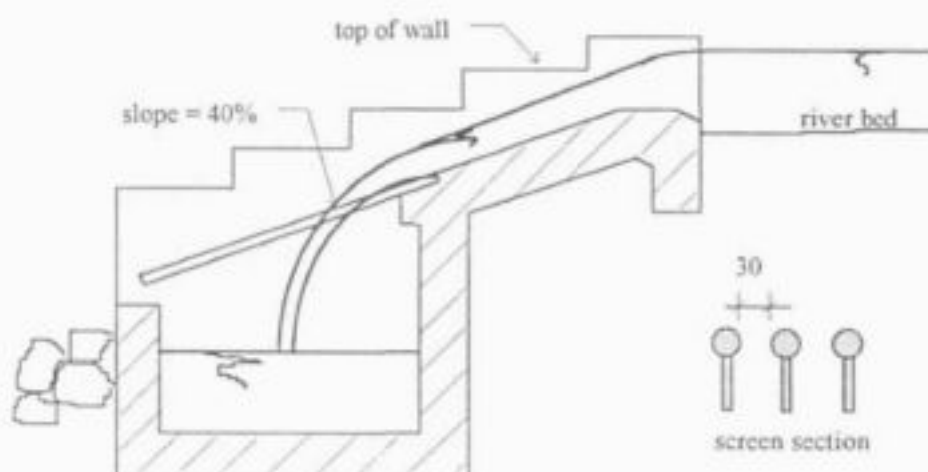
Section through the trashrack installed on the River Pradin, France
